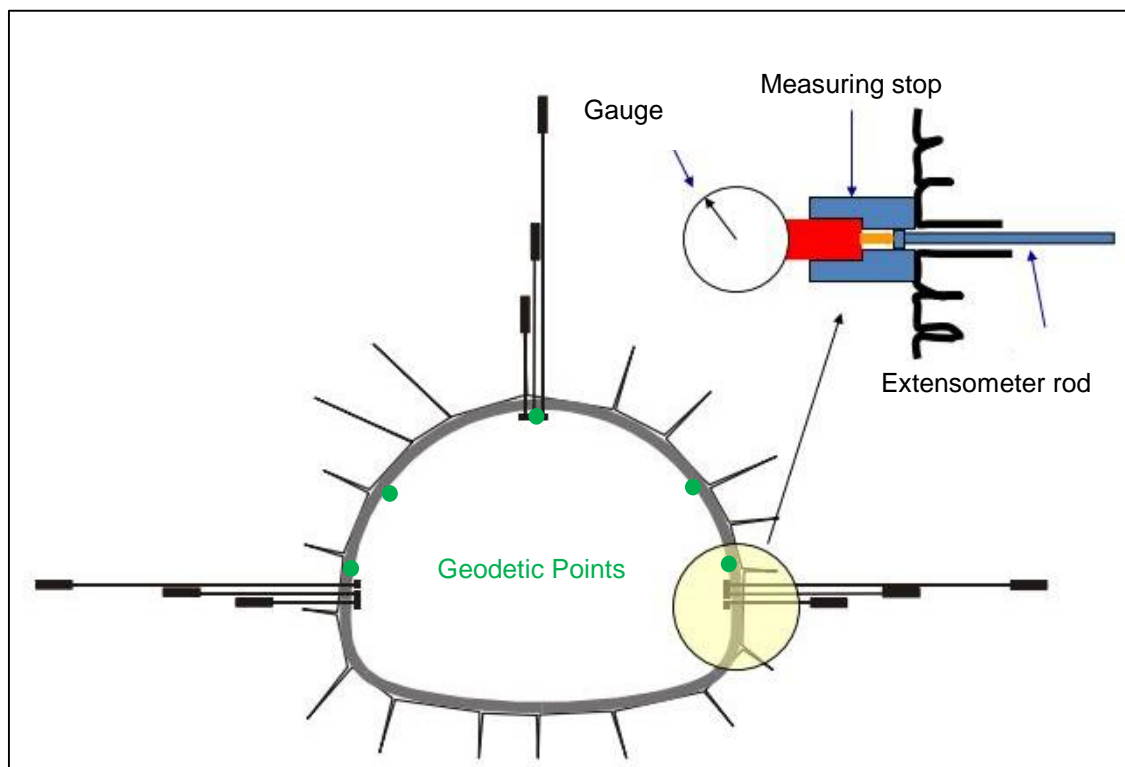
Monitoring installations in an tunnel with NATM method [35]
